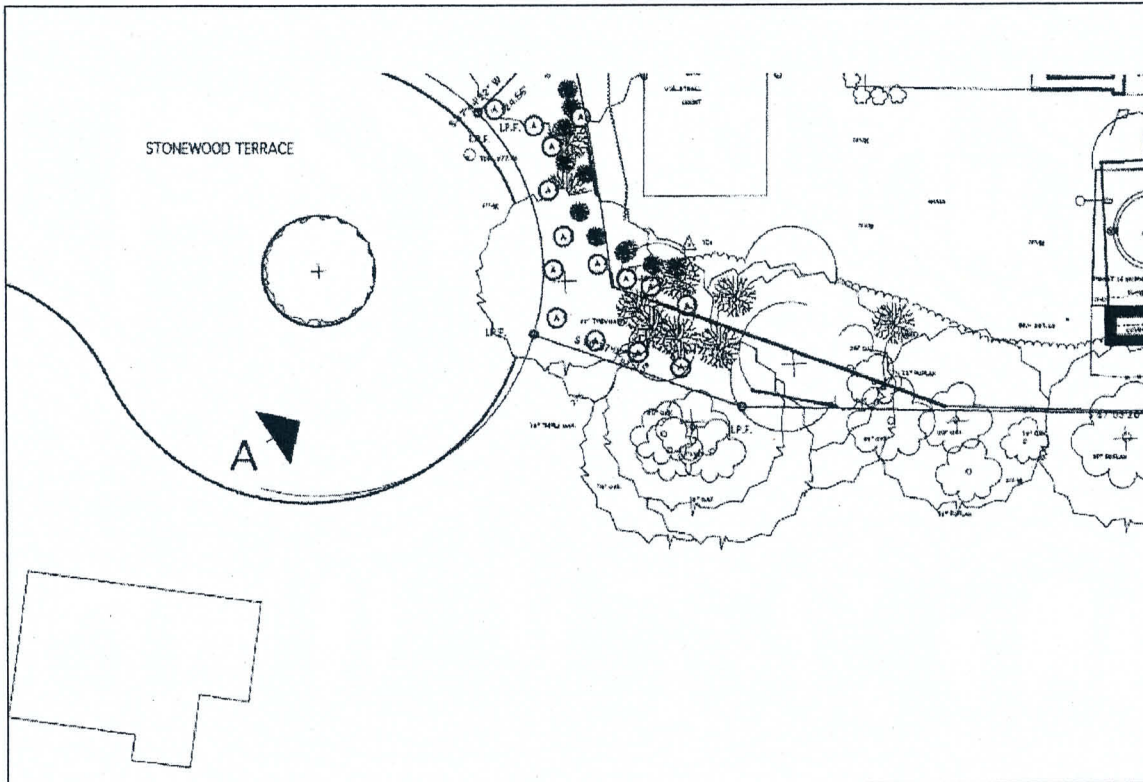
Petitioner's October 6, 2009 proposed Landscape Plan.
